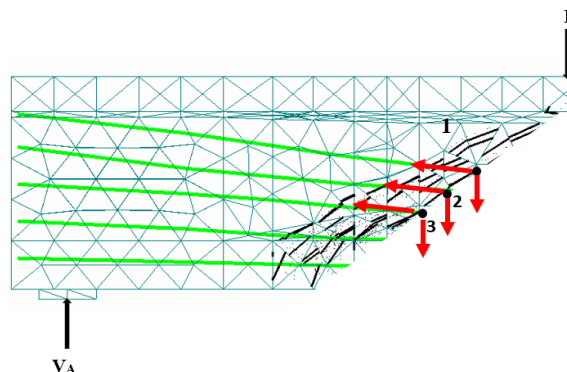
Cross-section cracked in shear in beam T-R2.
